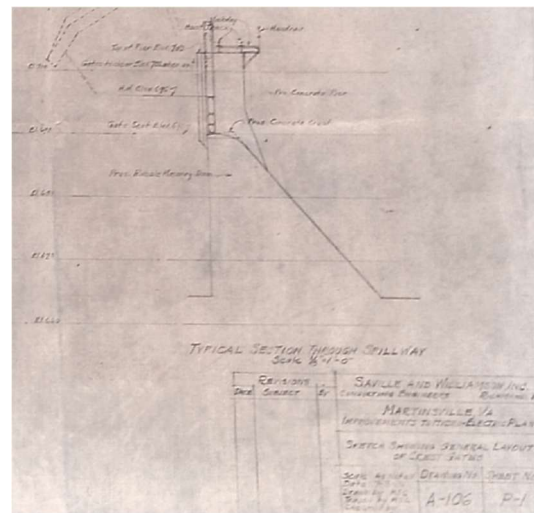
Portion of Elevation Drawing by Saville and Williamson, Inc. (Kendrick 1923)
